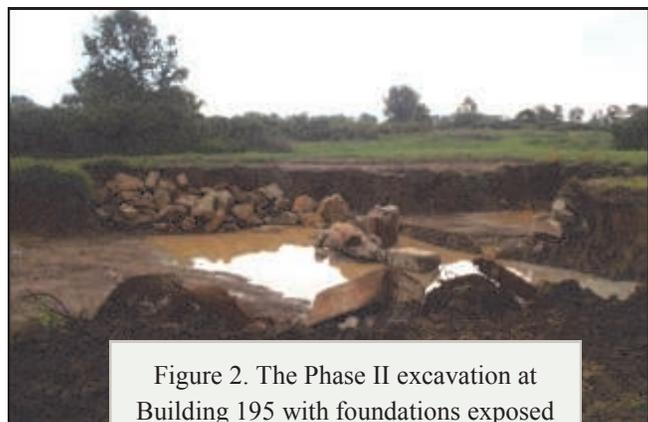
The Phase II excavation at Building 195 with foundations exposed
